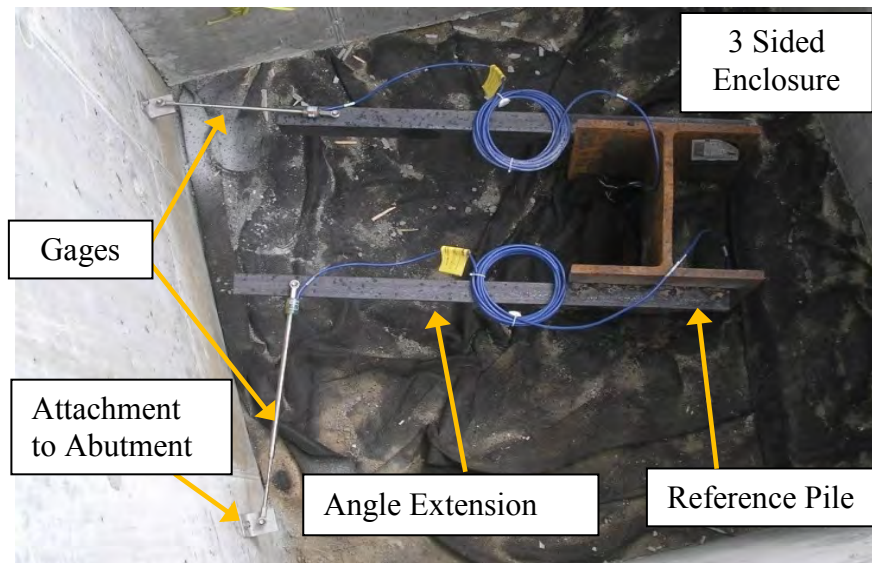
Displacement Transducers at Stockbridge Bridge
